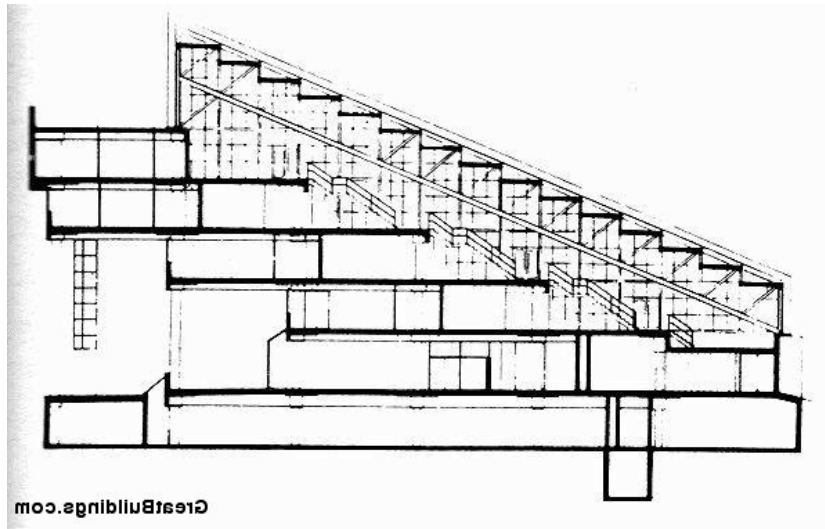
Gund Hall Building section, showing stepped façade system and circulation patterns.⁷⁴
